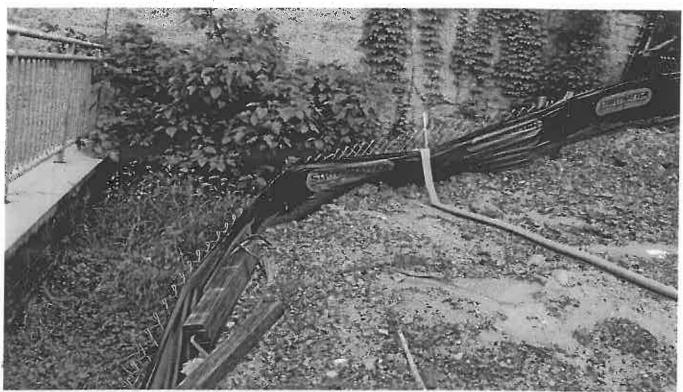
Unmaintained E and S controls at the Slope of the Tunnel Project North of the Site
